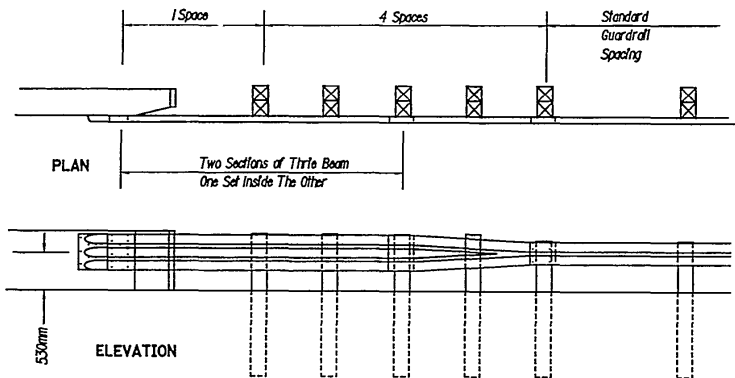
Tapered Concrete Bridge Railing with Thrie-Beam Approach Rail and Oversized Posts
